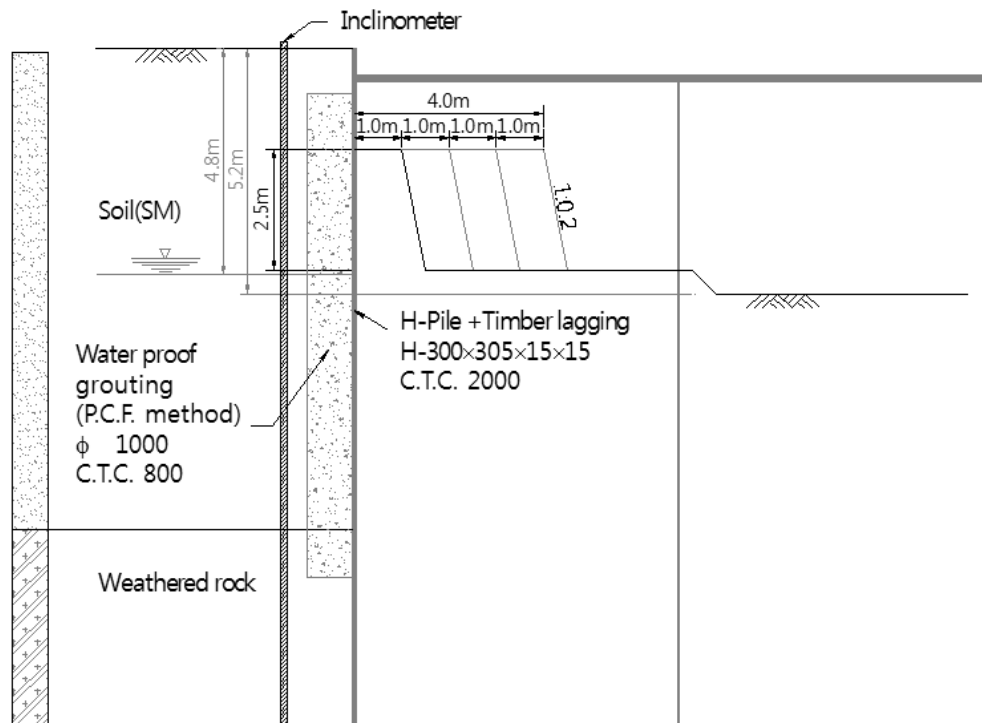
Cross-sectional diagram of 5.2m bermed excavation at the site
